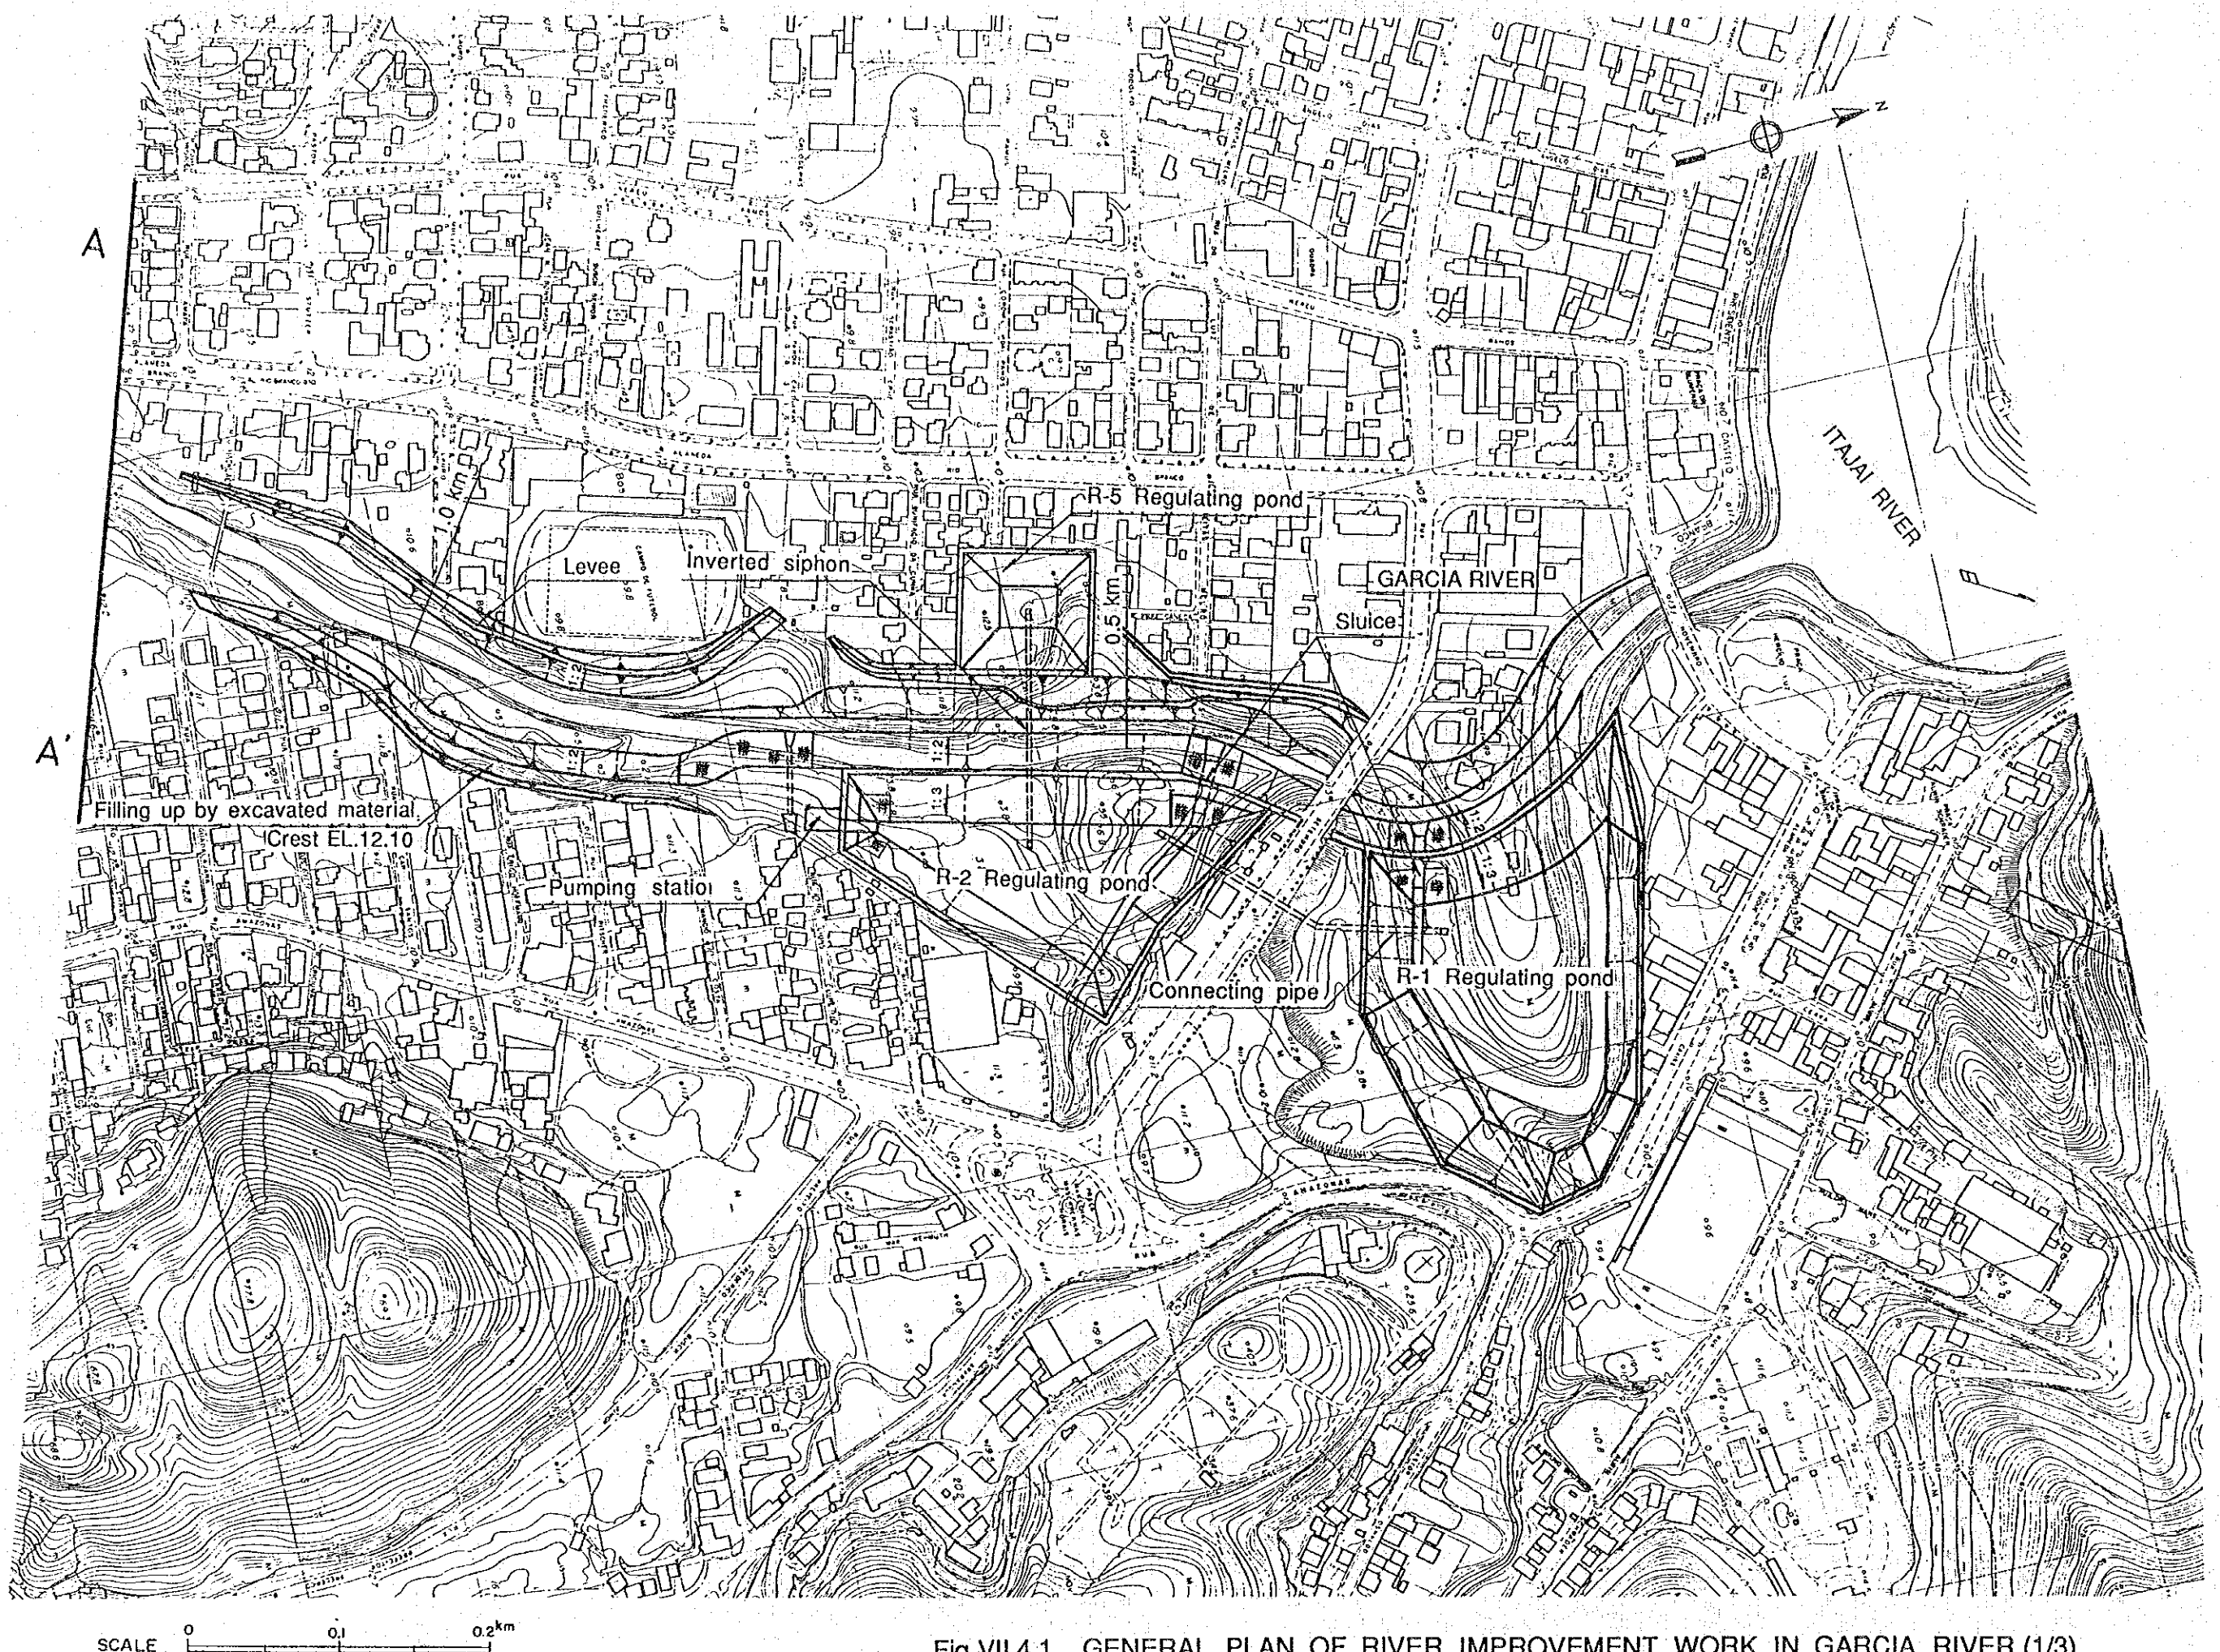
GENERAL PLAN OF RIVER IMPROVEMENT WORK IN GARCIA RIVER (1/3)
